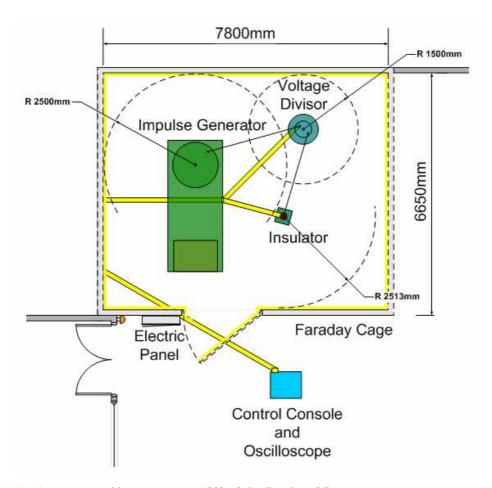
New suggested layout at room J003 of the Faculty of Engineering.
